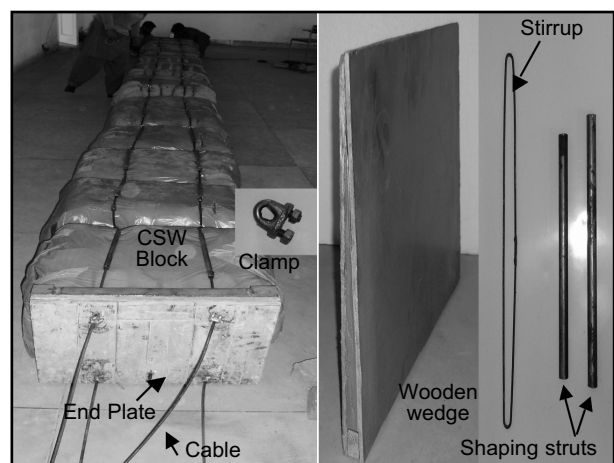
CSW-blocks laid in straight line, cables, shaping struts, stirrups, clamp and end plate.
